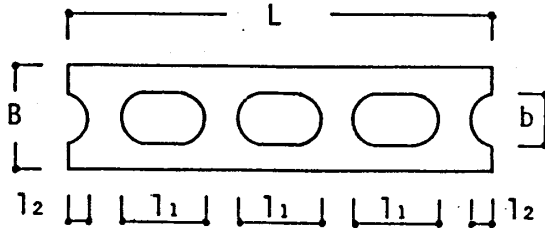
Dimensions of Test Specimen (Lateral Loading)
